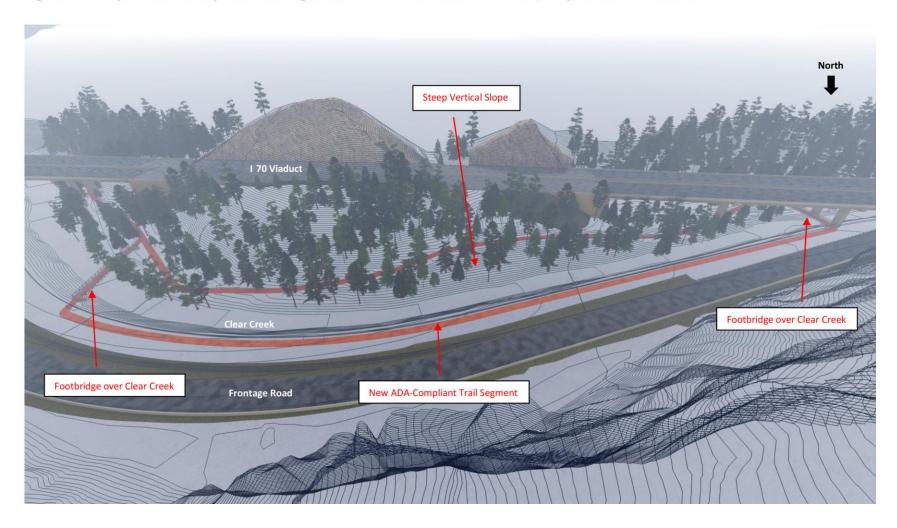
Proposed ADA-Compliant Trail Segment, Scott Lancaster Memorial Trail, Canyon Viaduct Alternative
